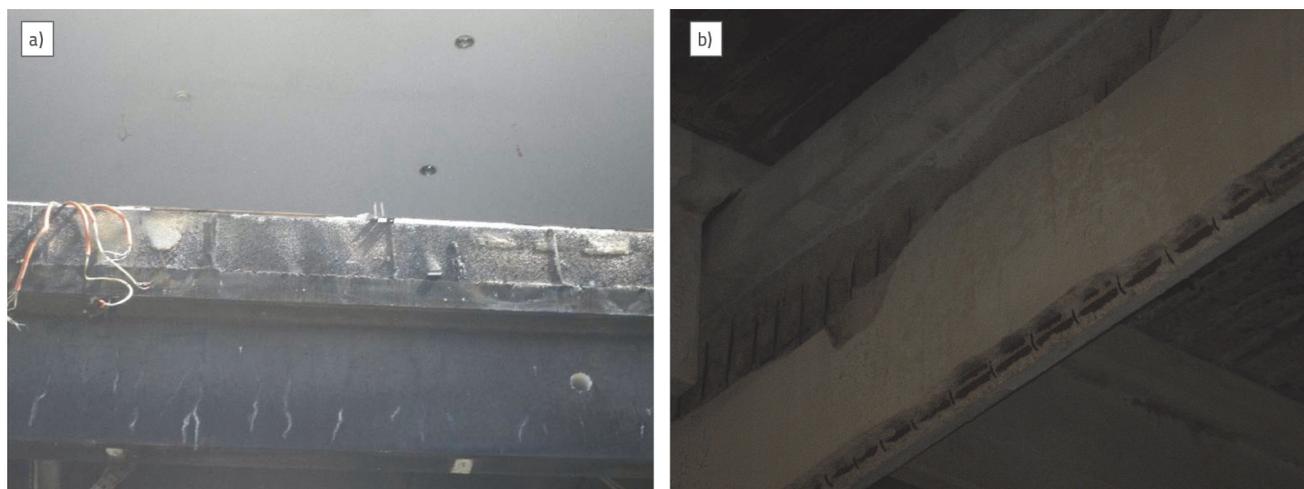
Beam damage caused by fire: a) visible cracks at external face of the beam; b) reduction of cross-section, exposed reinforcement
